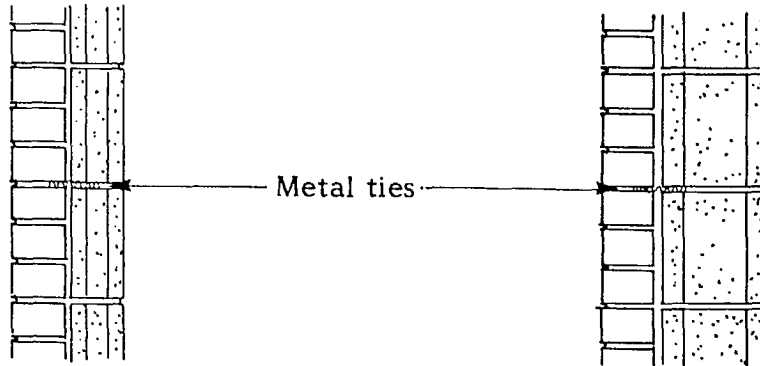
STONE-FACED WALL CONSTRUCTION
